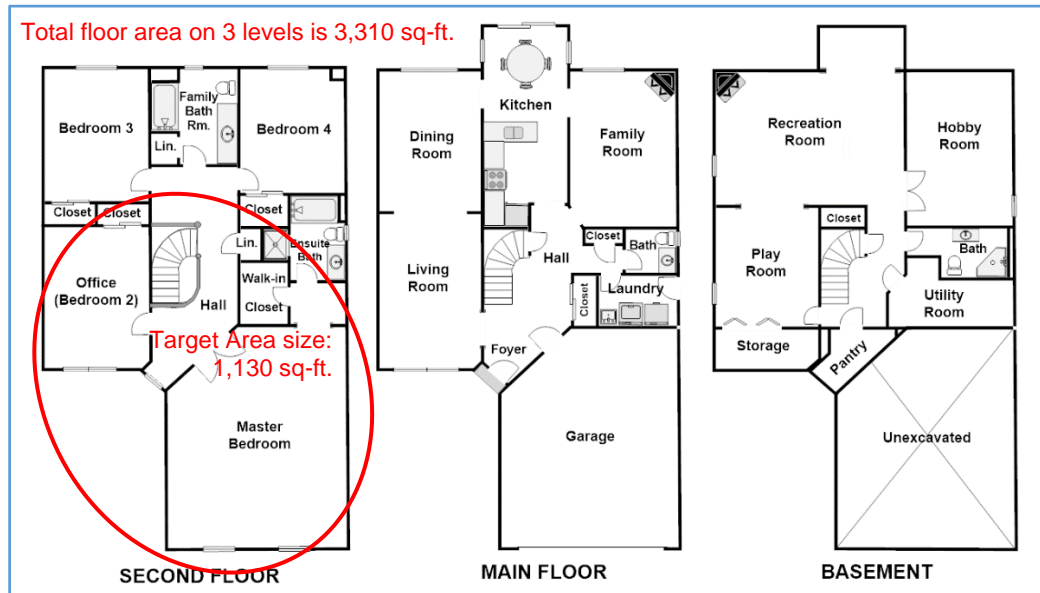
Two-storey house floor plans with Second-Floor Targeted Areas circled
